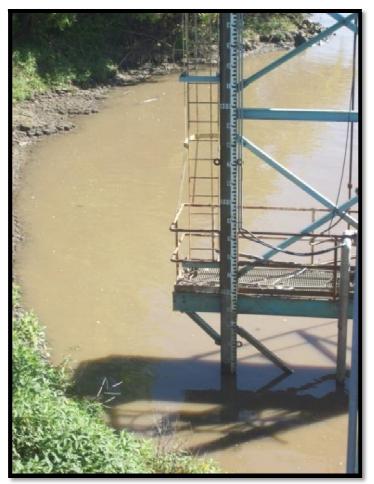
Staff gage at ash pond discharge area, Mississippi River. Outlet fully submerged.
